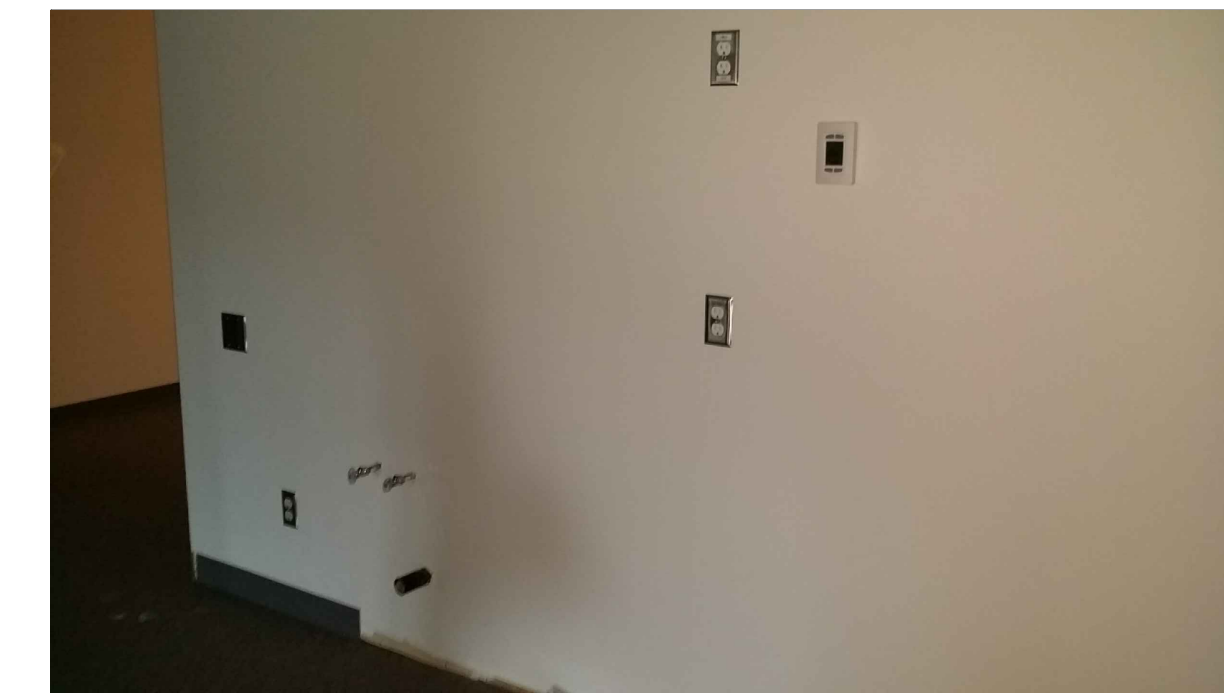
VIEW OF EXISTING PLUMBING STUBS ON RATED WALL WEST OF BOILER ROOM
